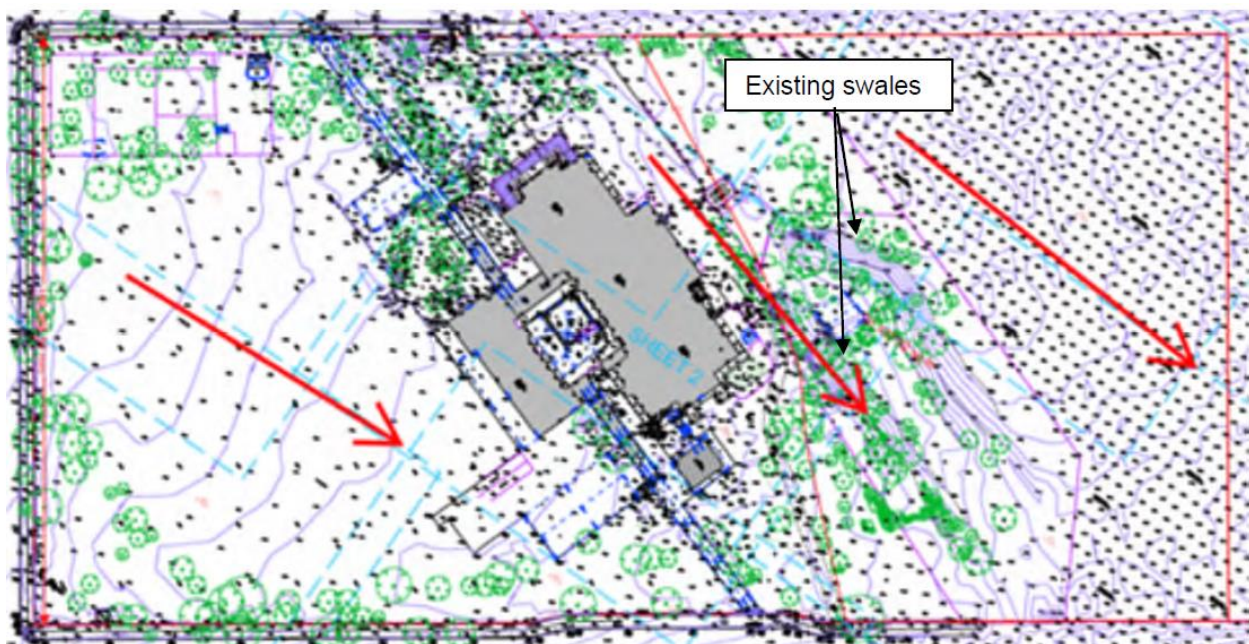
Site survey indicating falls & existing stormwater infrastructure (Source: TTW)
